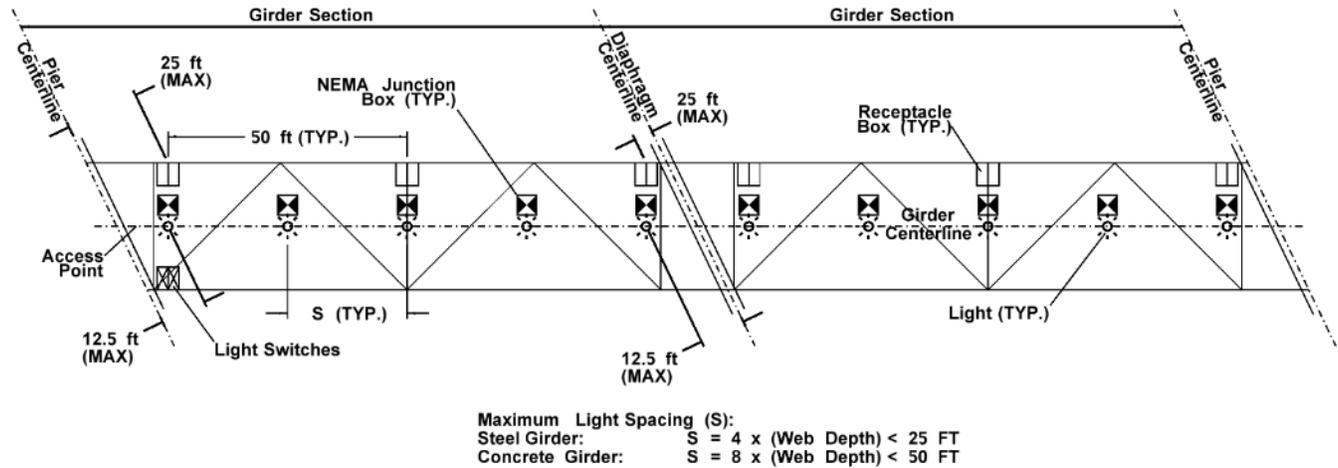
Bridge Inspection Lighting and Receptacle Circuit Layout
